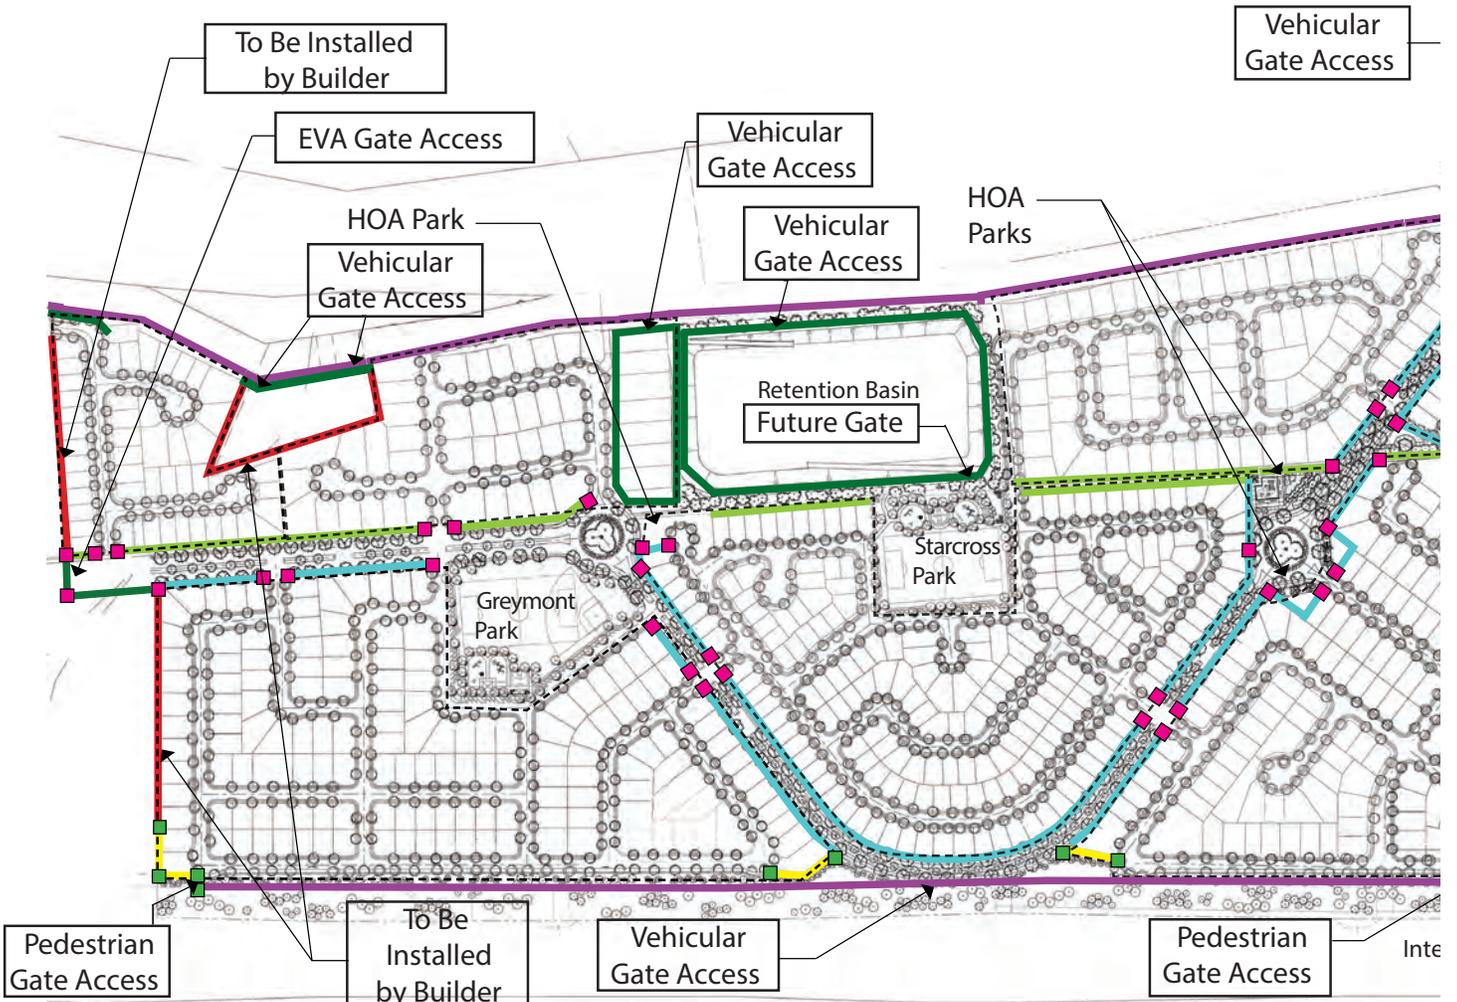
Master Wall and Fence Plan - Phase 1A
